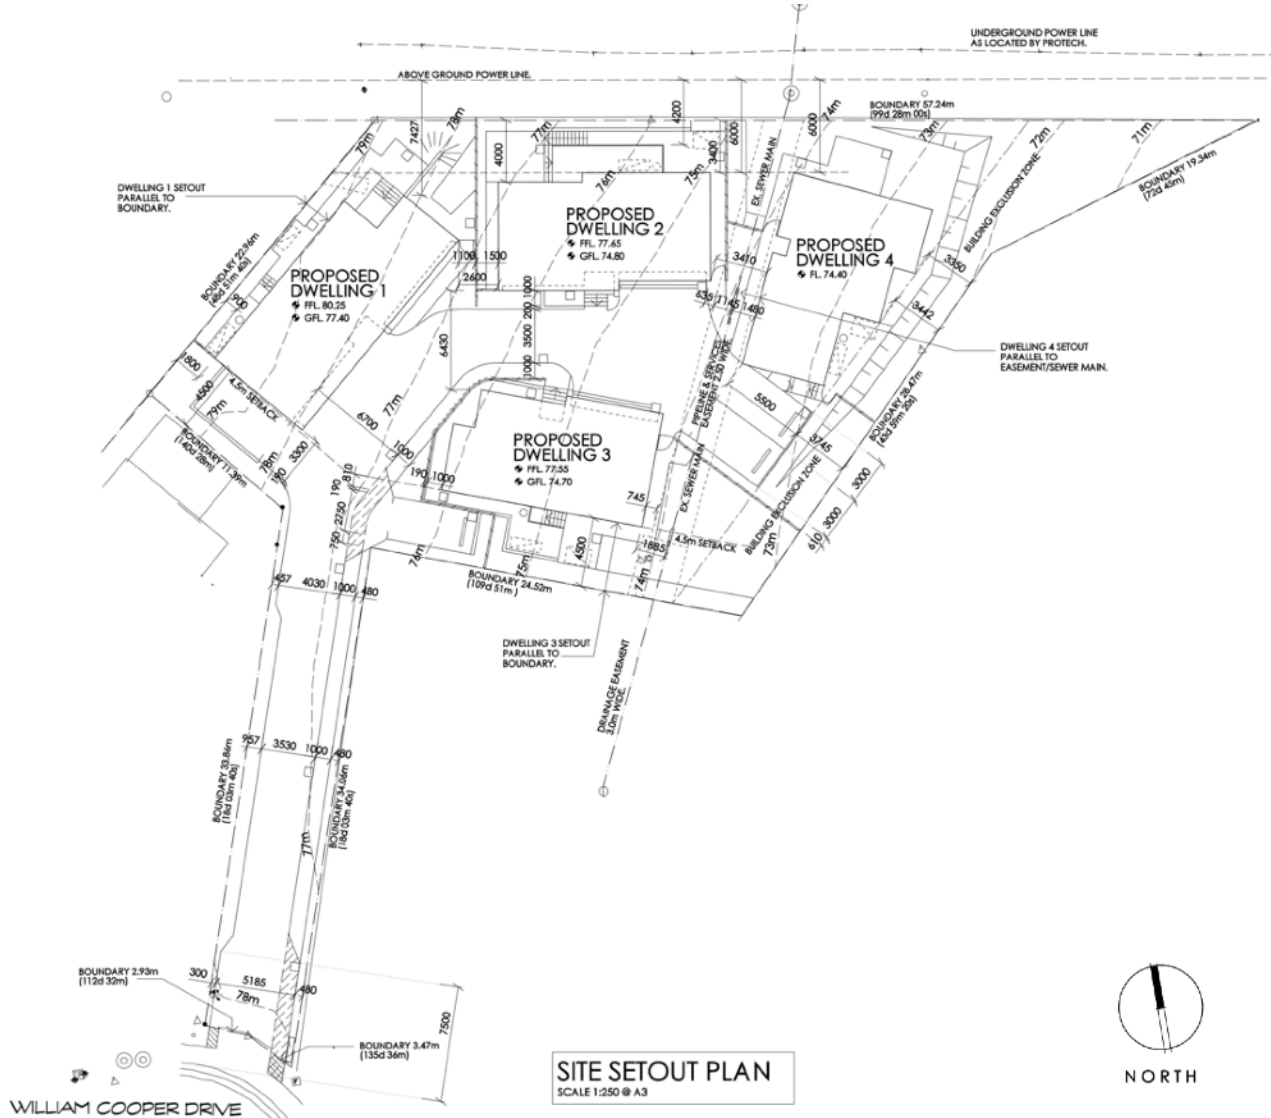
PROPOSED DEVELOPMENT - SITE PLAN
